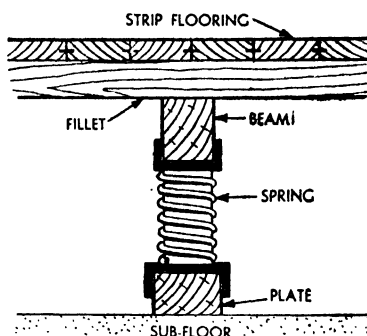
General principles of dance floor construction. The floor rests on springs adjusted to give required resilience. Fillets carrying the strip flooring are supported on cross beams which are carried by the springs.
